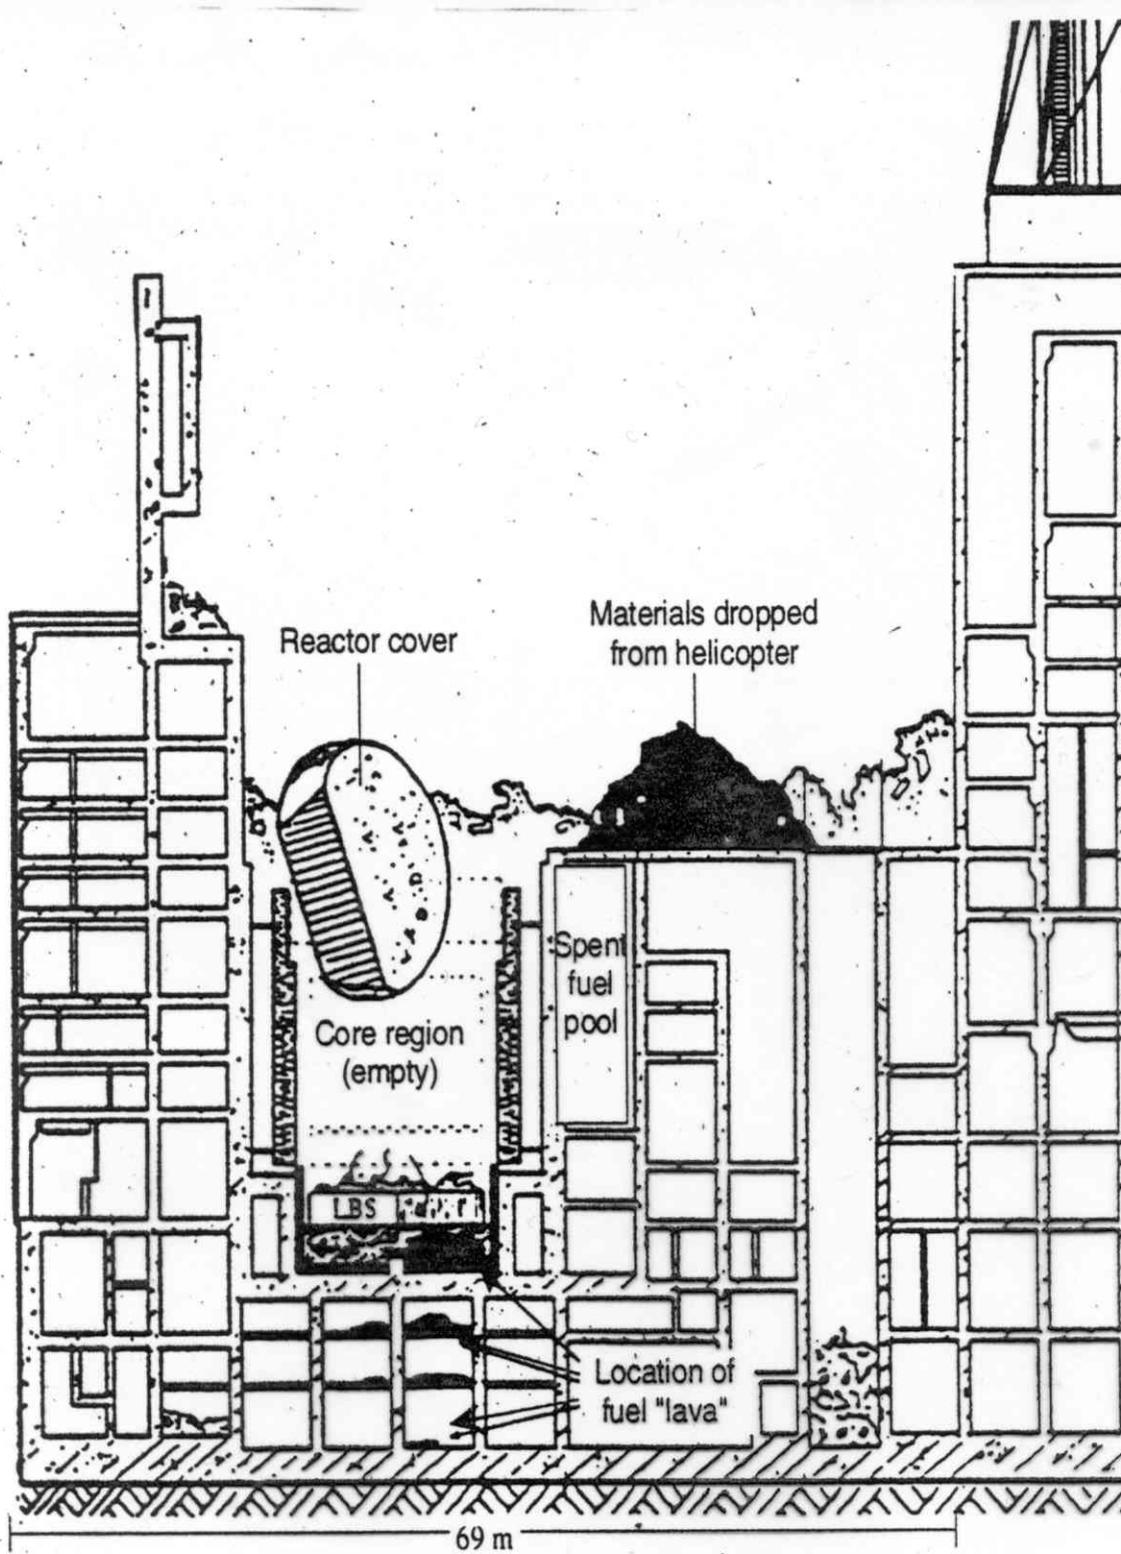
Cross-section view of damaged Unit 4 Chernobyl reactor building.
